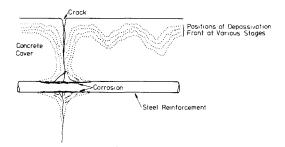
Schematic picture showing the advance of the depassivating front in the region of a crack in concrete cover to reinforcing steel (after Beeby [85]).
